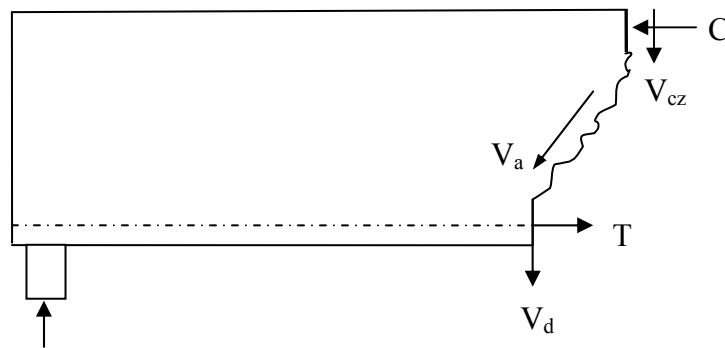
5: Internal forces at a diagonal crack for beams without stirrup (MacGregor 2000)
